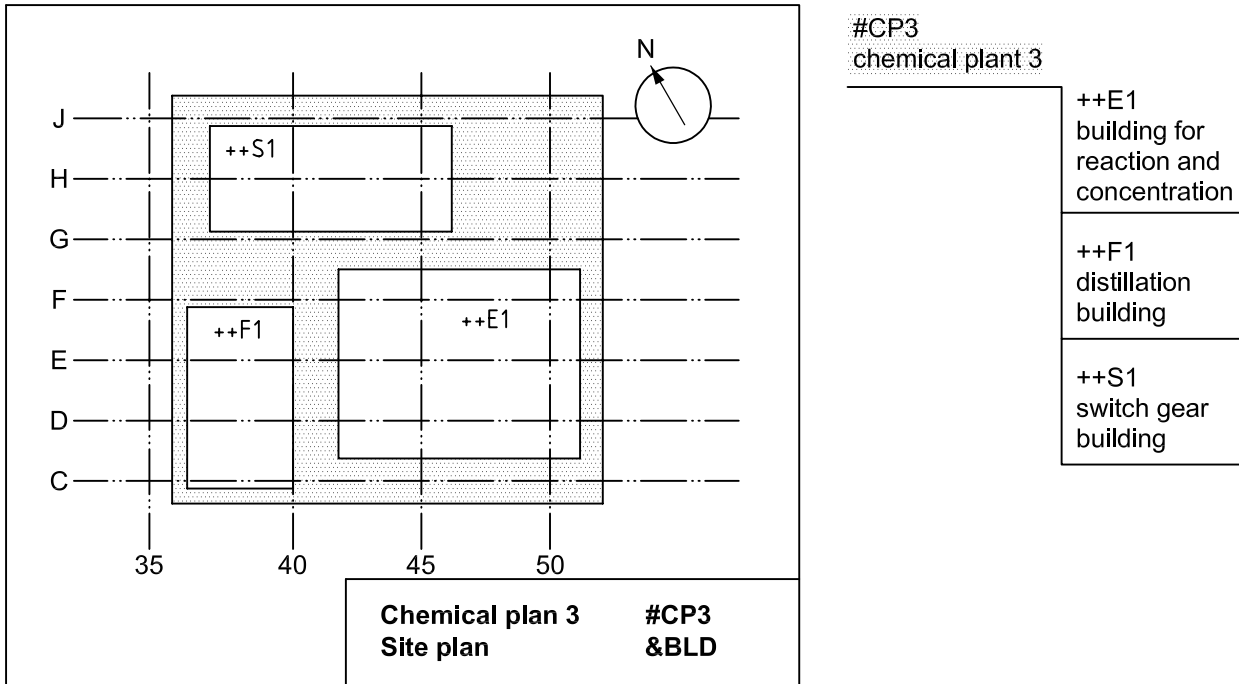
Site layout plan of chemical plant 3 (#CP3)
